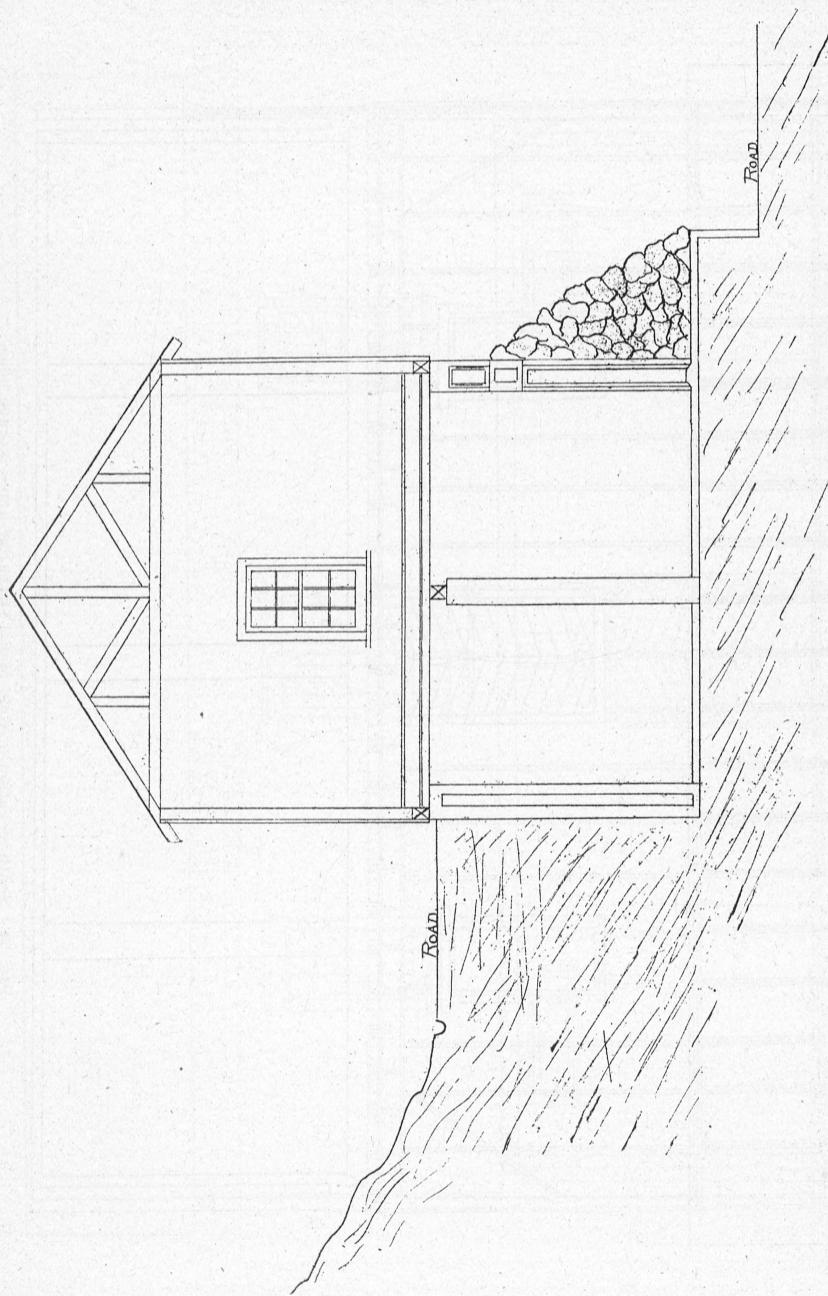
Cross-section of Gold Medal Orchards' apple storage house, showing earth insulation and position of roads.
